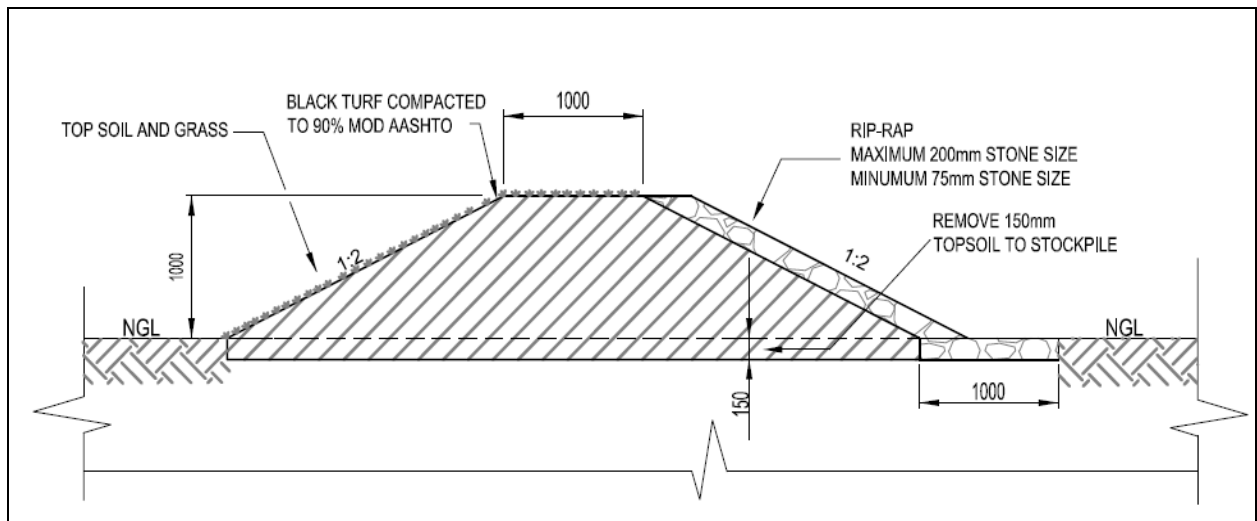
TYPICAL BERM FOR CLEAN STORMWATER DIVERSION SYSTEM (TWP)
